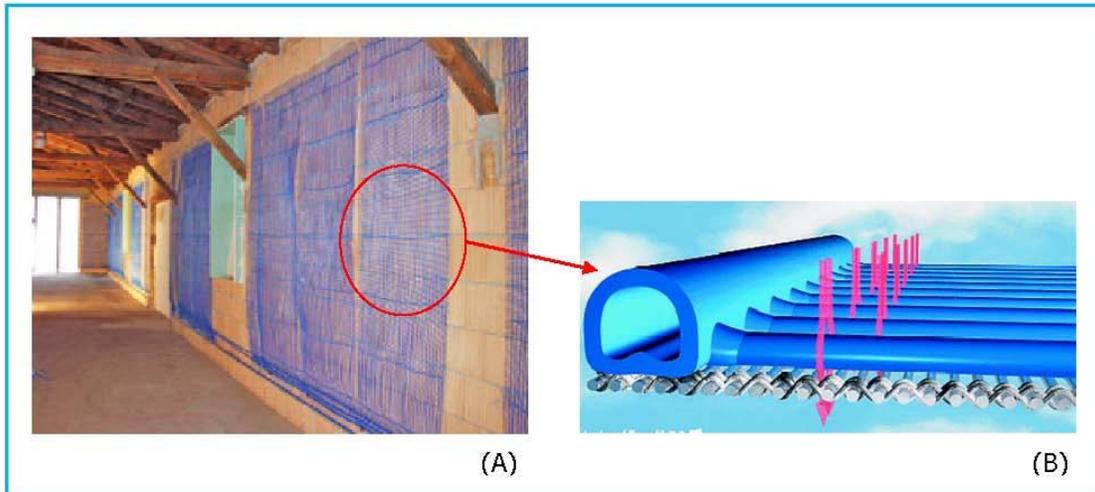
Chilled slab system; Typical installation (A). Floor details with RC system (B).
